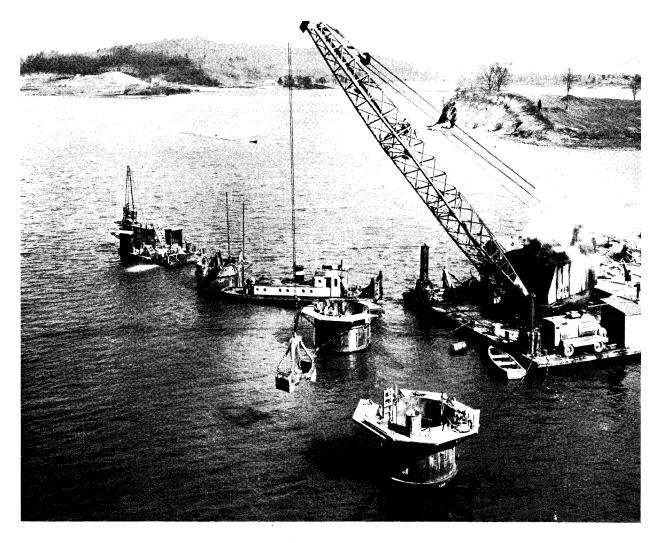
Installation of steel shells 45 feet long by 11 feet in diameter for the intake skimmer wall piers.
